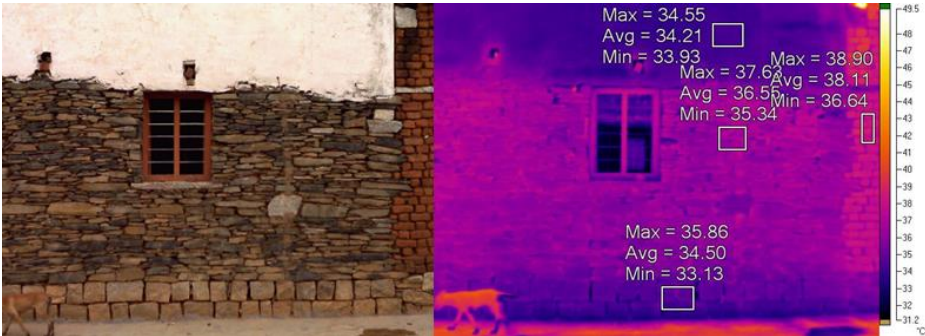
IRT of West wall 1 outdoor surface with 4 different wall types
